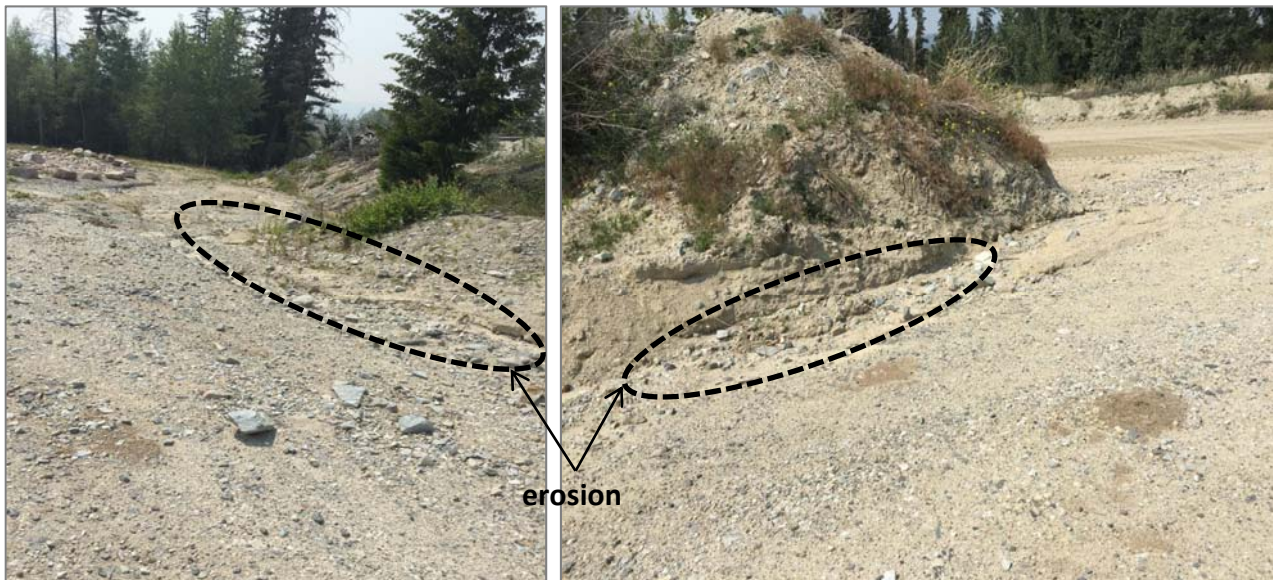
Downstream slope and spillway, looking south [left] and north [right] (BTH-2018-20)
